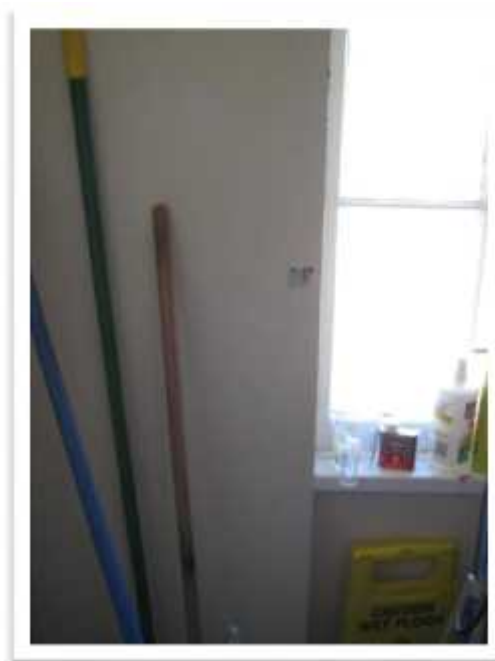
Drywall joint compound (Samples 243867-07A-E) sampled throughout the ground floor does not contain asbestos (ground floor shower room pictured here).
